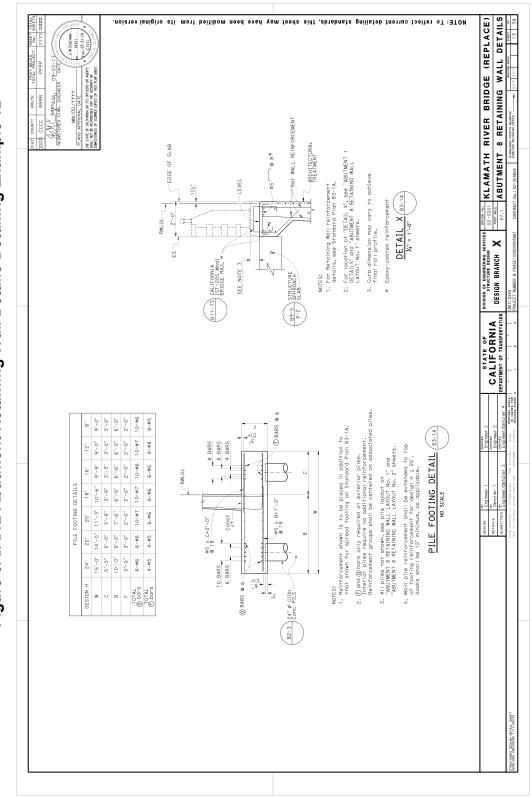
A.A.12 Abutment Retaining Wall Details Detailing Example 12
